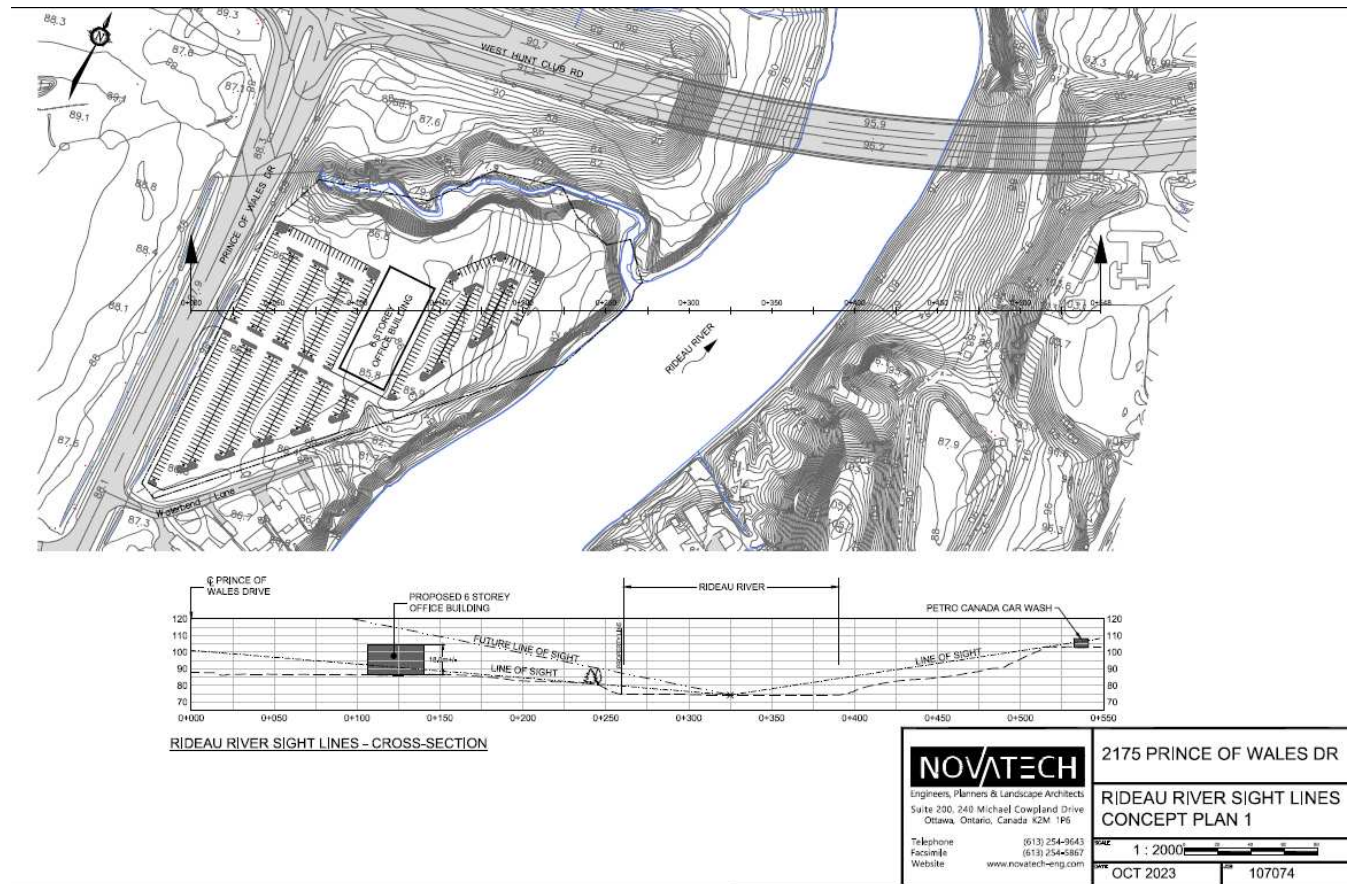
Plan view of Concept #1 a 6-storey office building with a cross section establishing the lines of sight from the Rideau River without trees and a future line of site with trees. Source: Novatech 2023.
